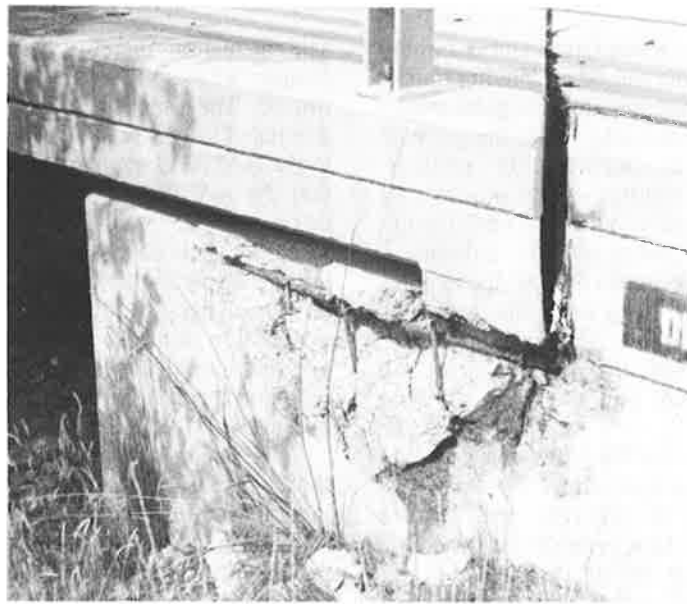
Severe spalling of concrete at abutment due to transverse thermal movement
